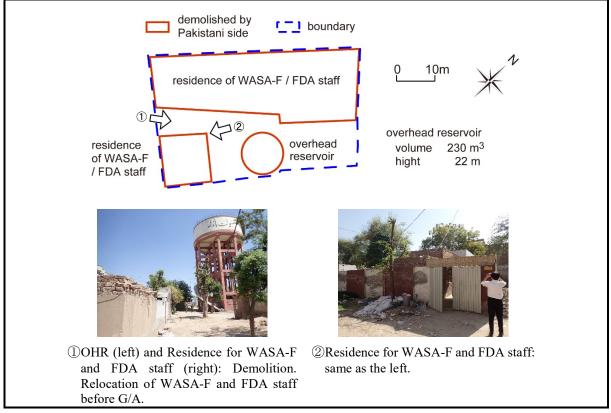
Dismantling of existing facilities at Madina Town No. 2 DC
